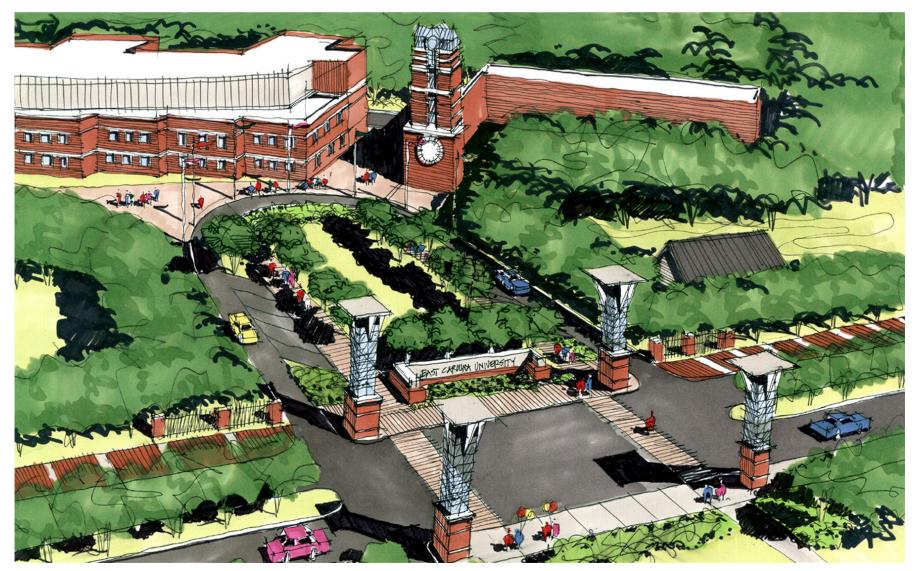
New Gateway Entrance to Downtown on Evans Street
